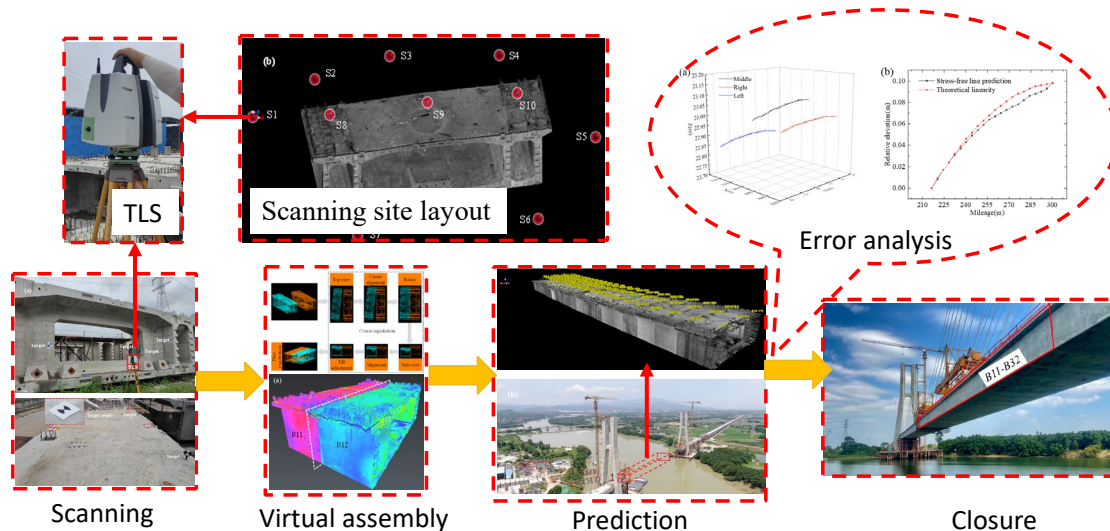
Construction Monitoring of Zengjiang Bridge
